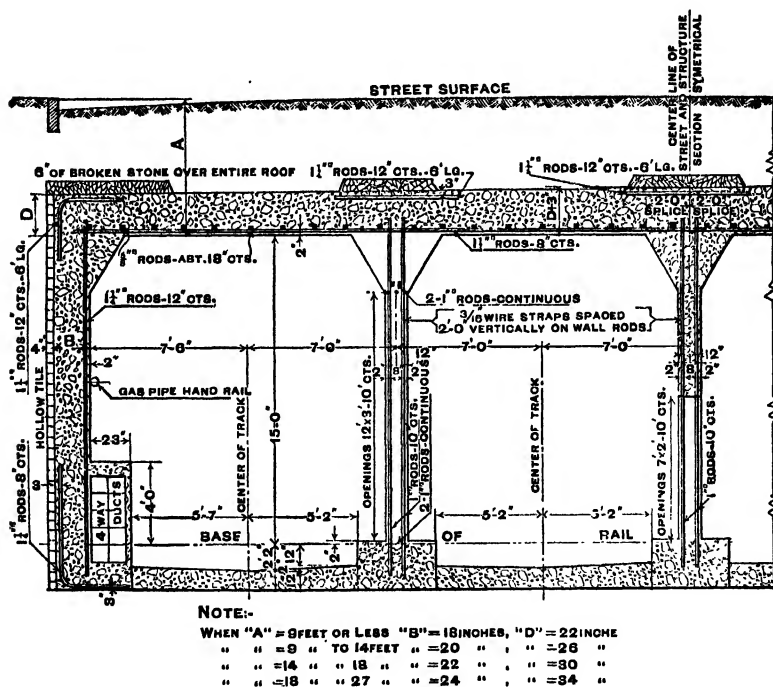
Typical Section of Reinforced Concrete Construction in New York Subway. (See p. 692.)
